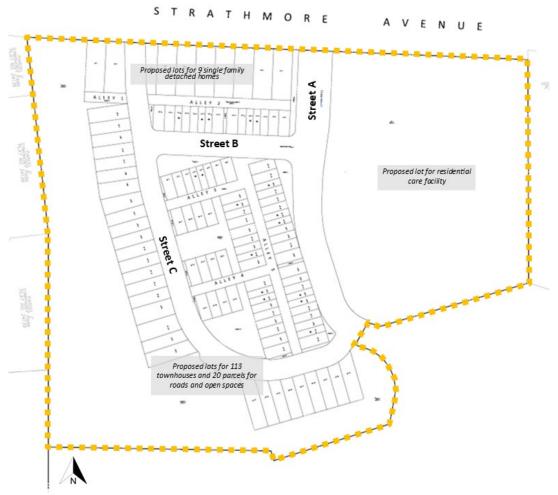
Proposed Subdivision Plan (Subject Property outlined in bold dashed line)
